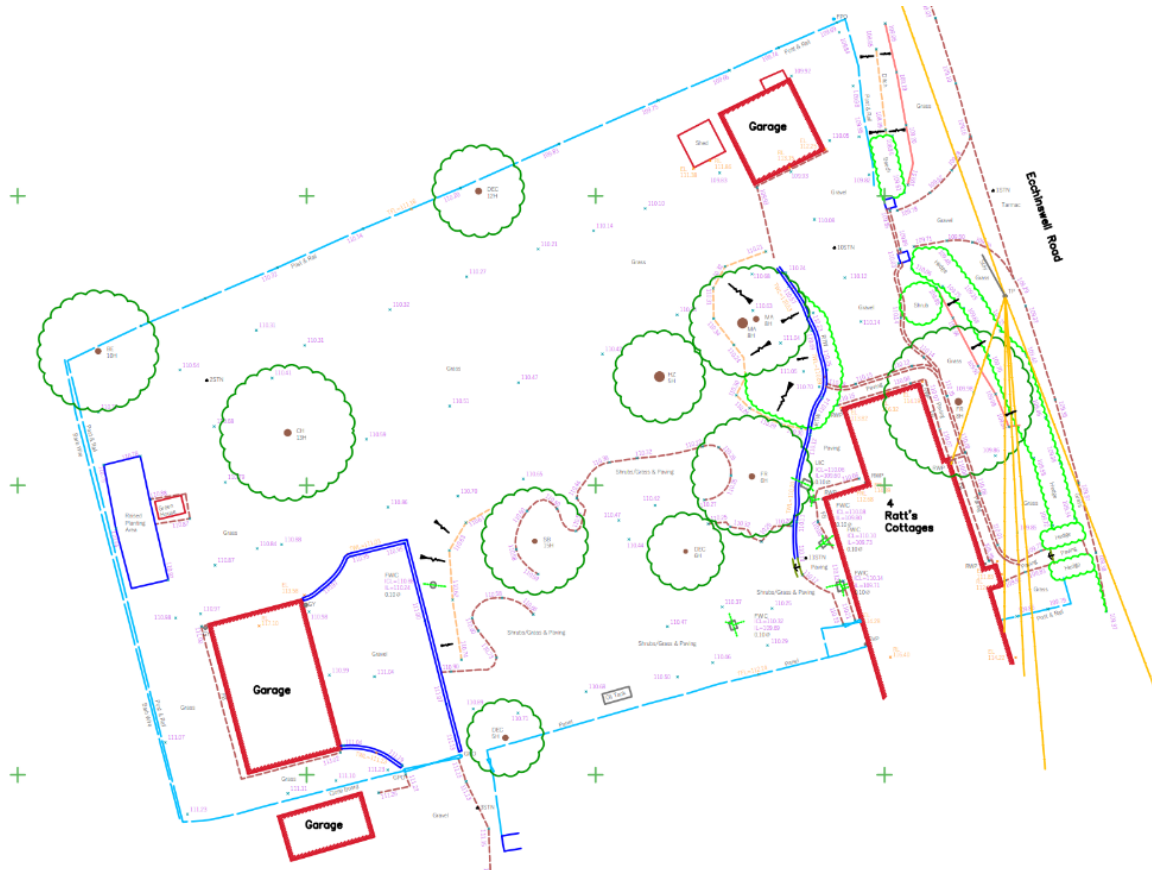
SHOWING THE EXISTING SITE PLANS.
